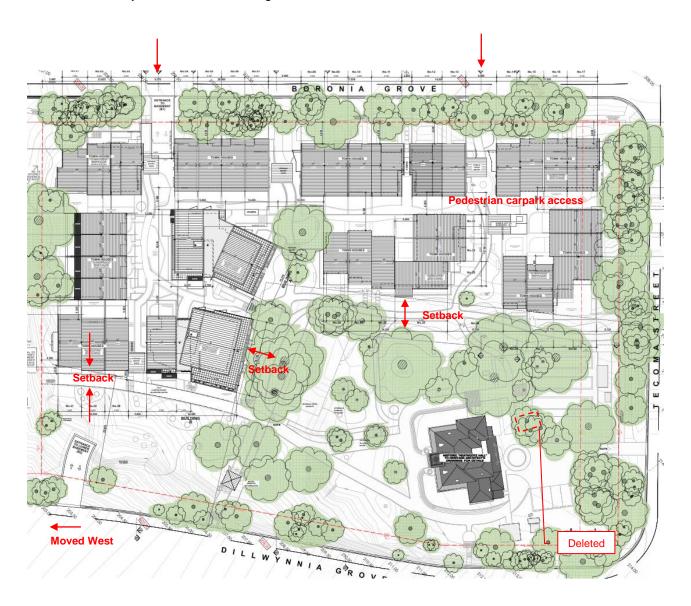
Proposed and amended to the requirements of the OEH residential development. Drawing by the Architects.
